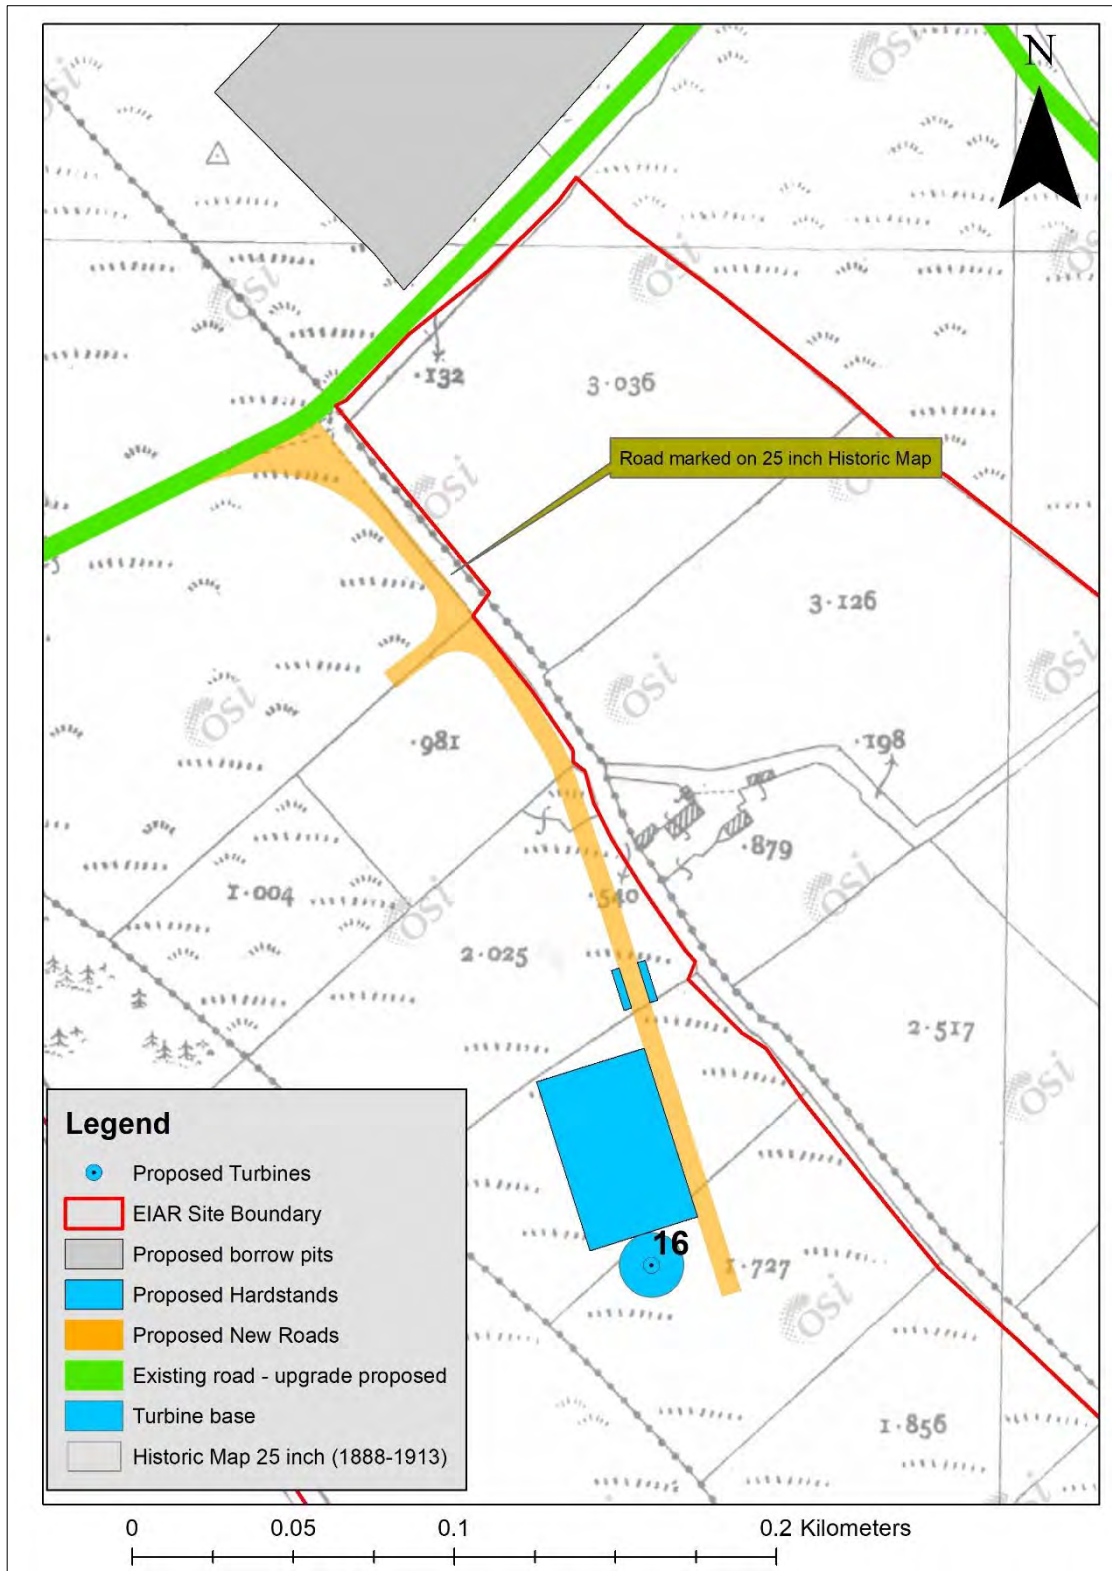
Historic passageway proposed to be utilised as part of the new access road to T16.
